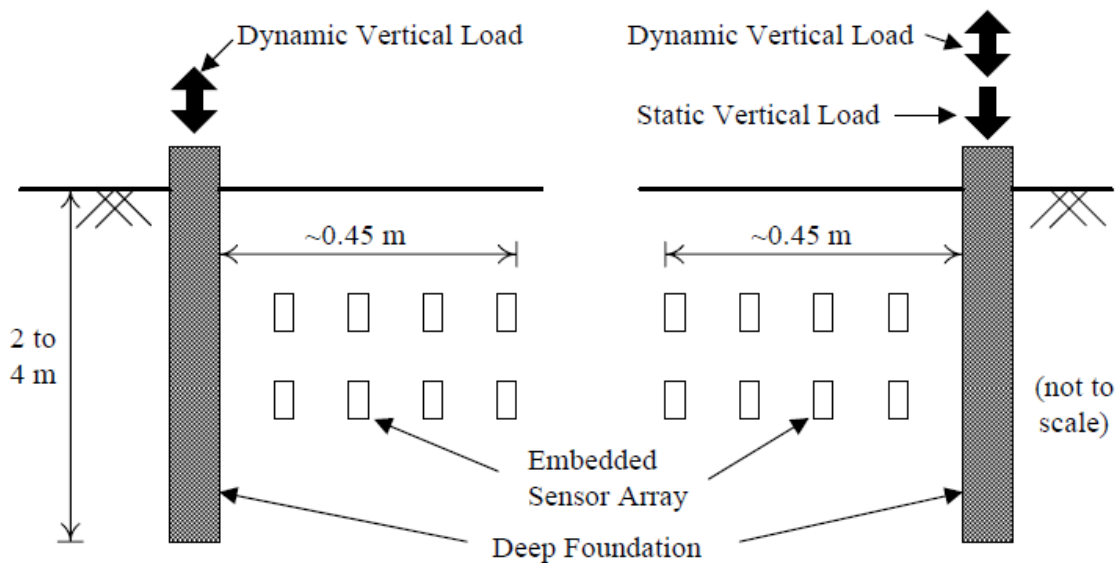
Generalized testing arrangements to measure nonlinear shear wave propagation in-situ with a dynamically loaded drilled shaft: (a) no static load and (b) with additional static load (from Stokoe et al., 2006)
